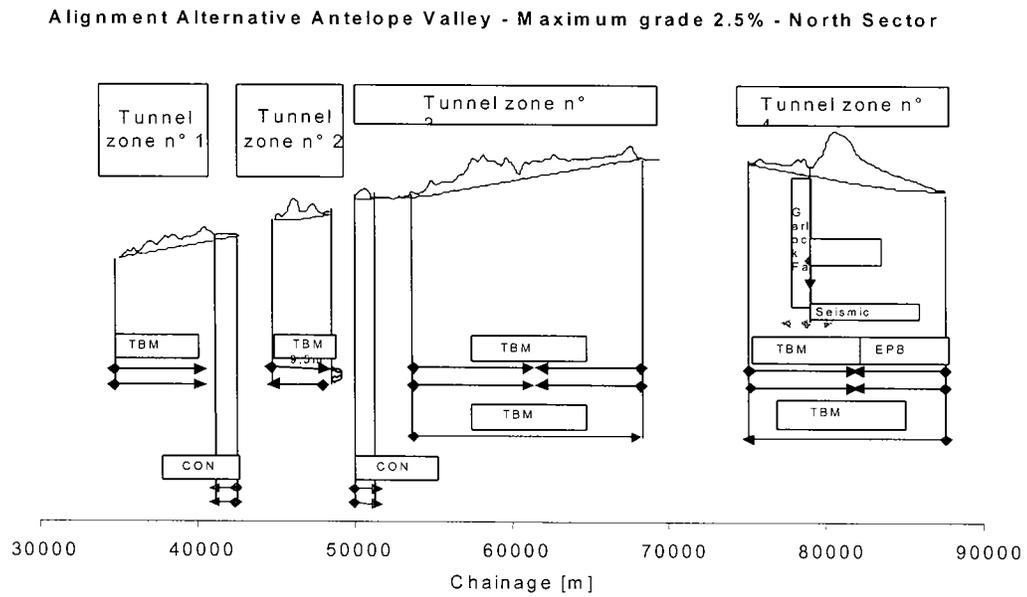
AV Alignment with 2.5% maximum grade – Tunnel profile and construction scheme
